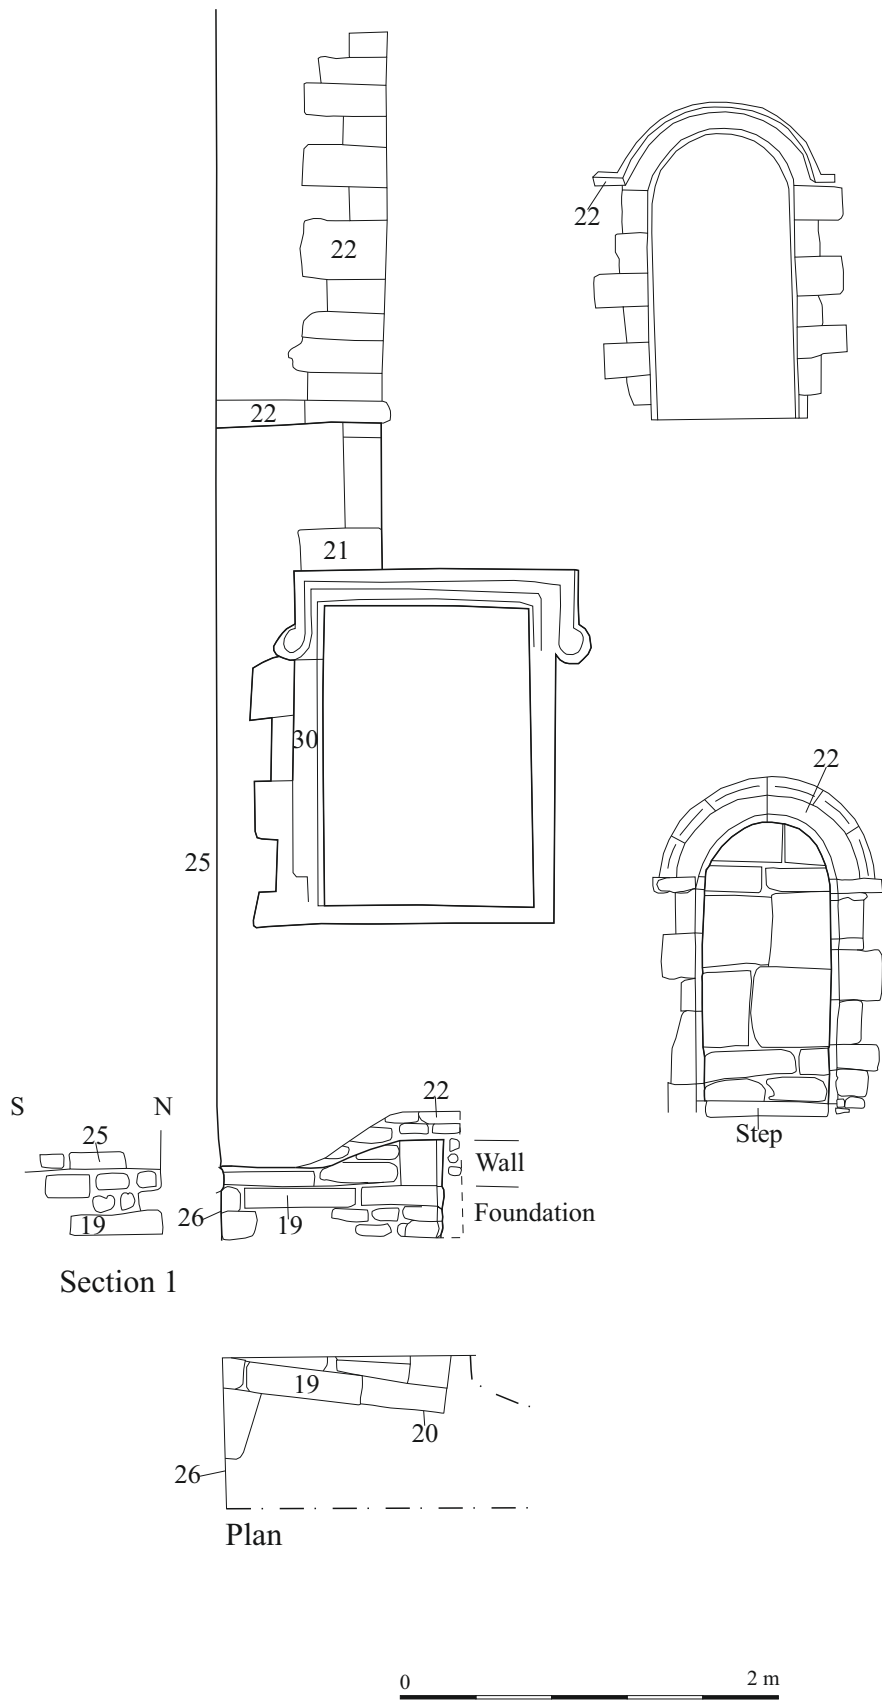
Elevation of north Chancel wall & plans of earlier foundation
